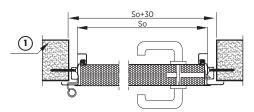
Installation of a single-leaf door with a corner frame without a thermal break to a steel structure – horizontal cross-section
